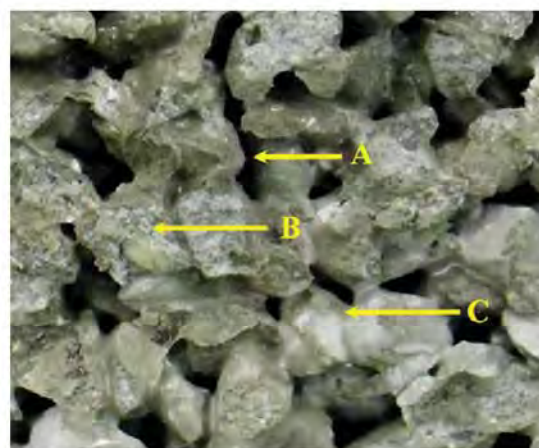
Fracture surface of PGC containing RC; (A) void; (B) fractured RC at attached mortar; and (C) geopolymer paste.
